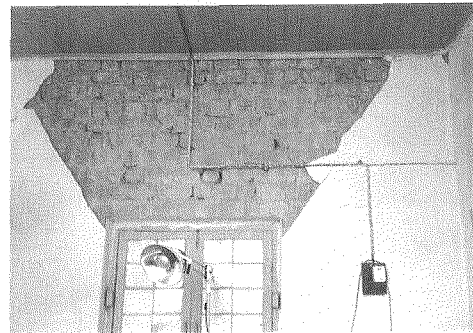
Non-structural damage to Pucca, Civil Hospital, Drosh
